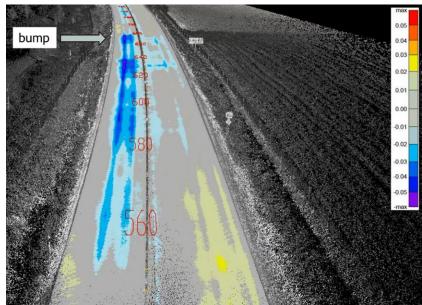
An example from laser scanner point cloud video from Sweden showing a long section with high rutting after a single bump on the road. The bump causes impact loads to the pavement due to the suspension system of trucks, which leads to faster deterioration of the pavement.
